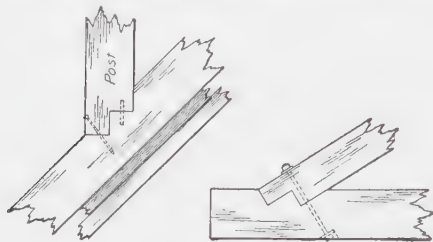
Single Step Joint at Middle of Roof Truss.
